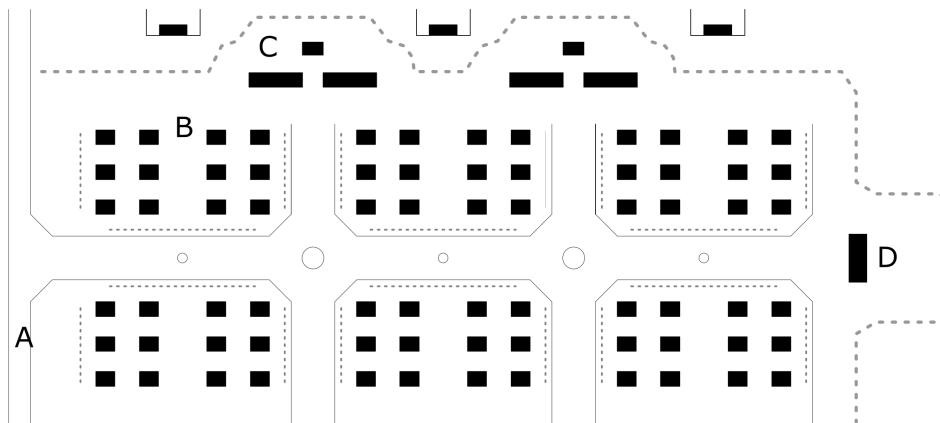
Diamang's "Transit village" present as a "model plan" (Source: author's drawing; from SPAMOI's report, 1942, UC/AD); A – Road; B – Single houses; C – Latrines; D – Dining hall
